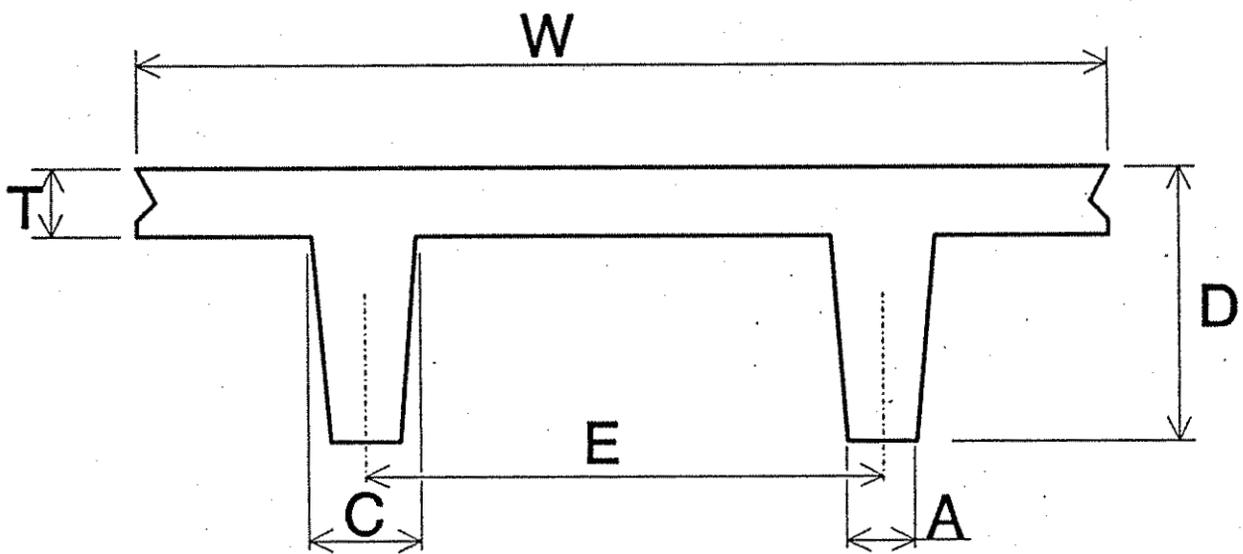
Standard prestressed concrete double-tee bridge girder.
